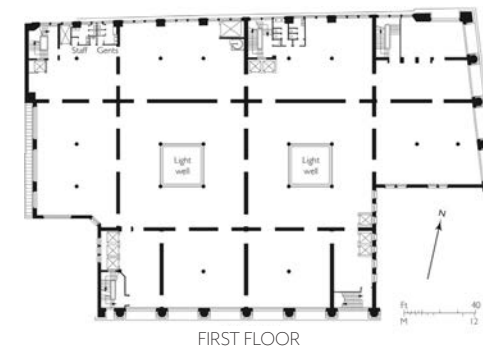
Selfridges 1907 Floor Plans. 406-422 Oxford Street
